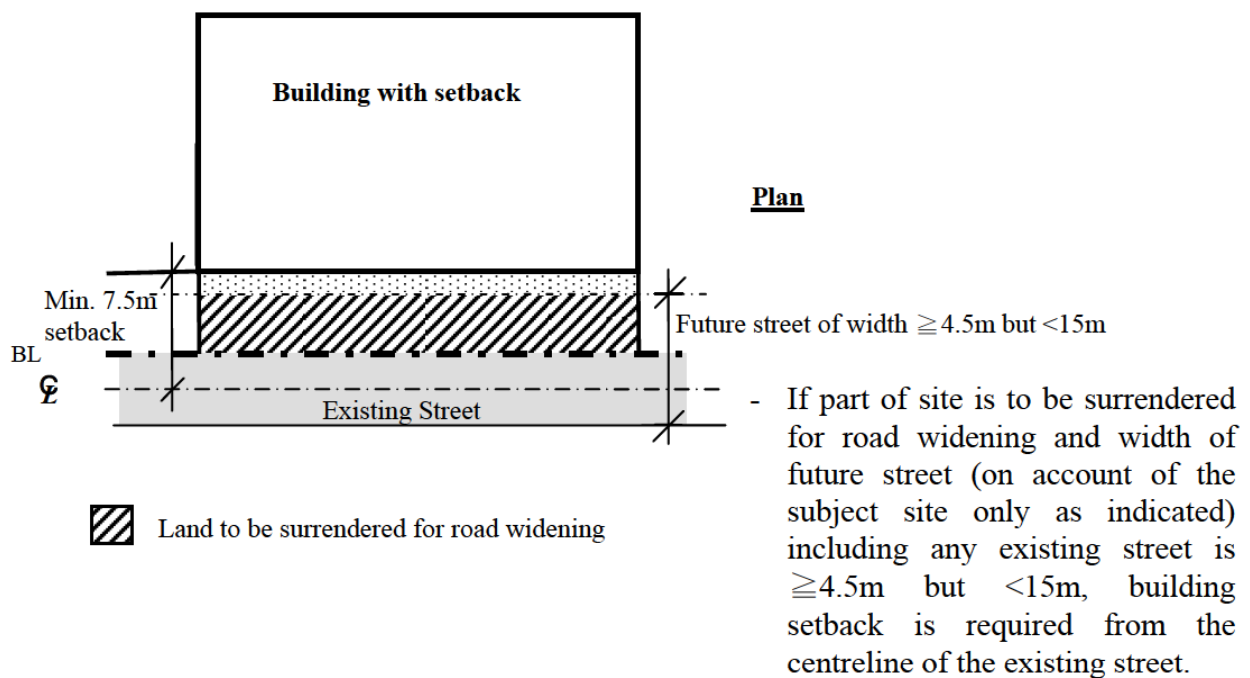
Example (2) of Building Setback – Portion of Site will be surrendered to form a future street
